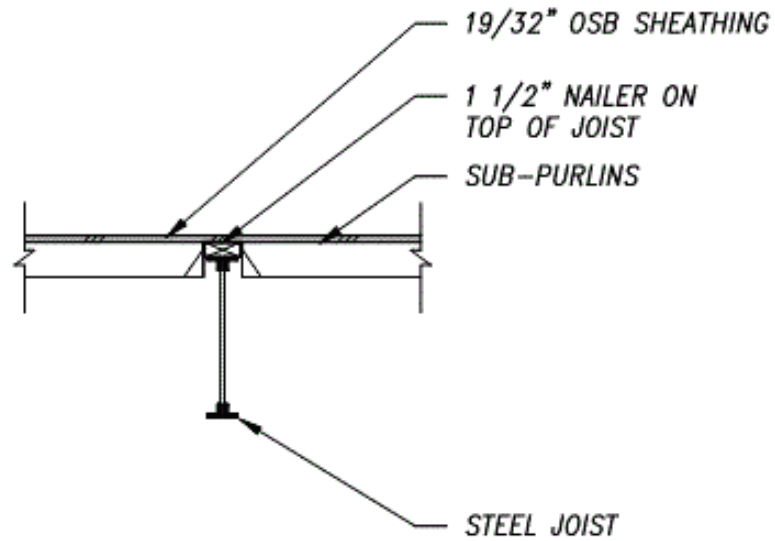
Single-story retail/industrial/warehouse building framing detail.
